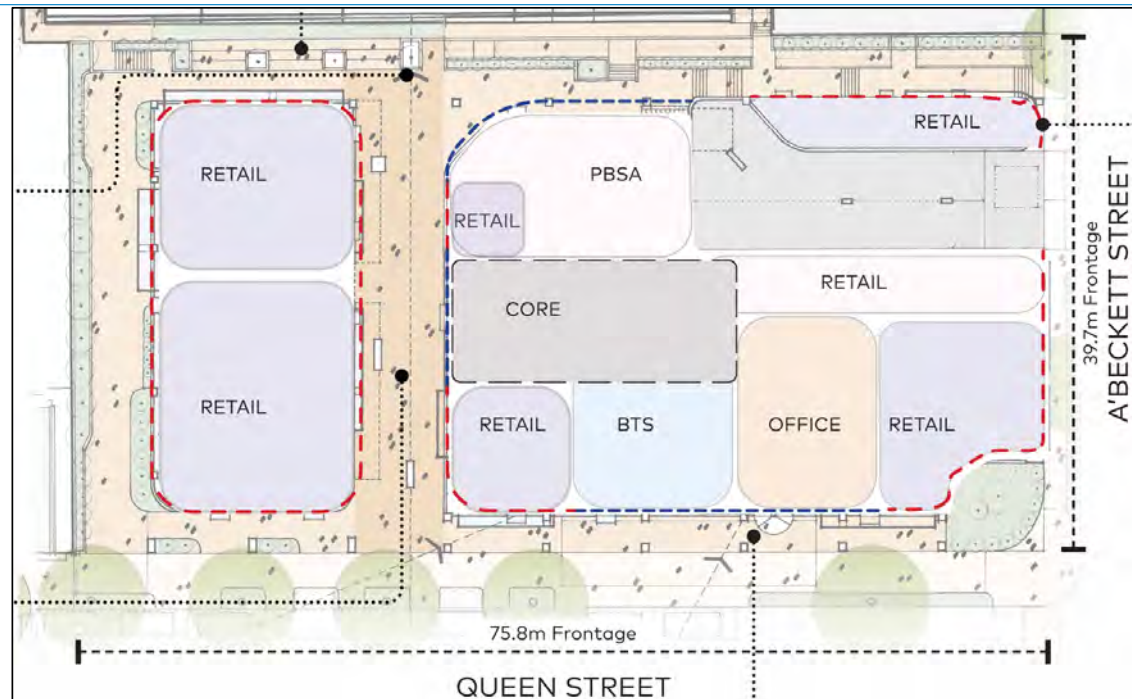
Layout of active uses at ground level (Source: Applicant, dated June 2025)
